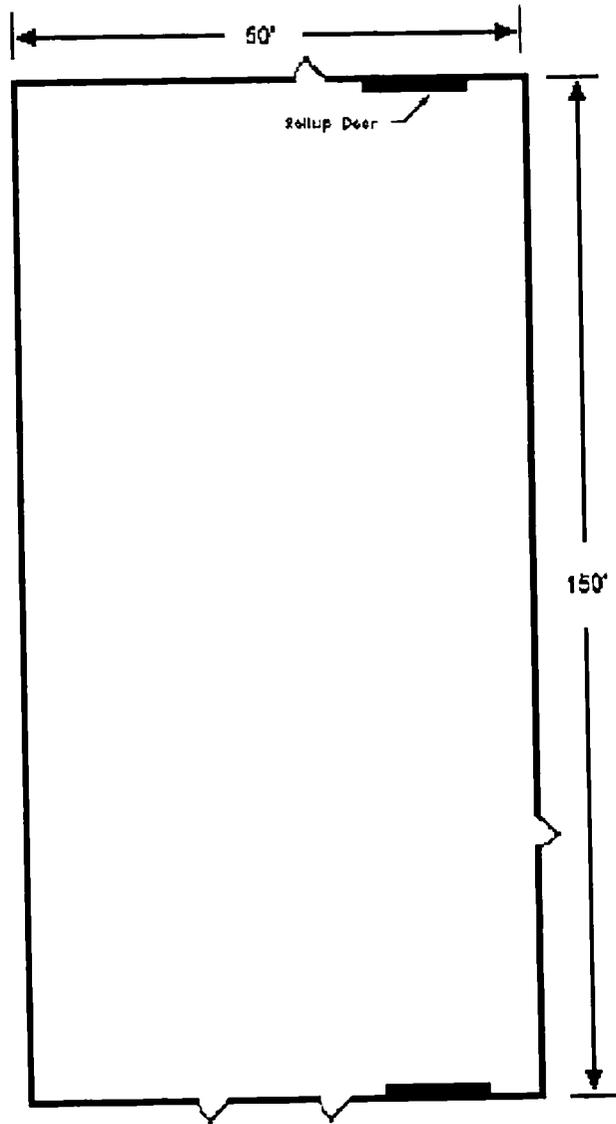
Waste Examination and Assay Facility. Building 7824.
